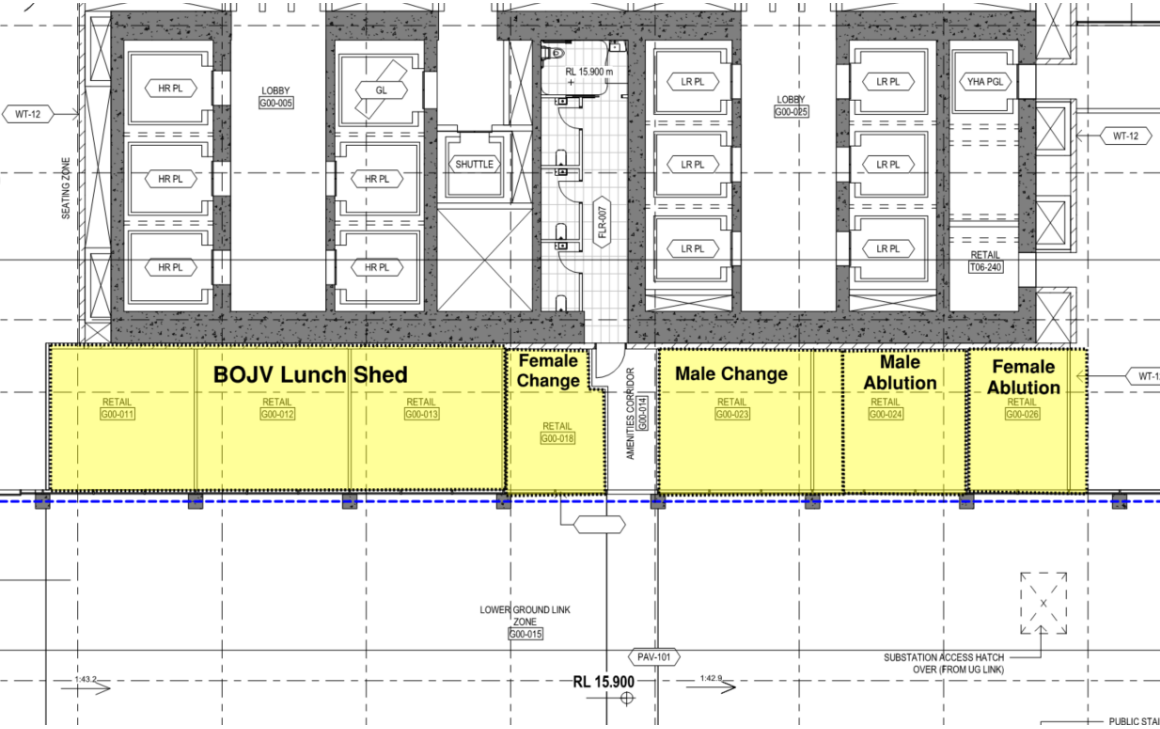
Indicative Site Accommodation – Lower Ground Floor Link Zone
